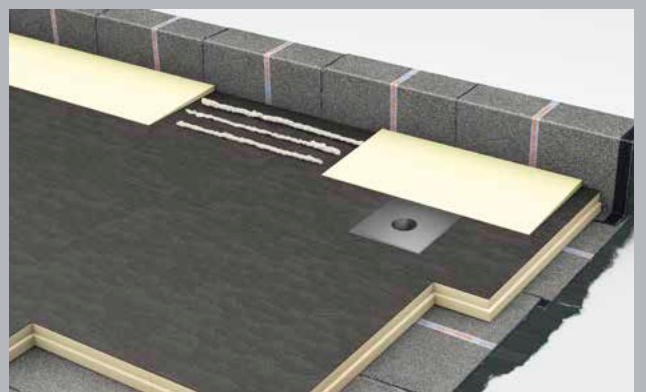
/2: Installation example for a BauderPIR T GGP counter-tapered panel
